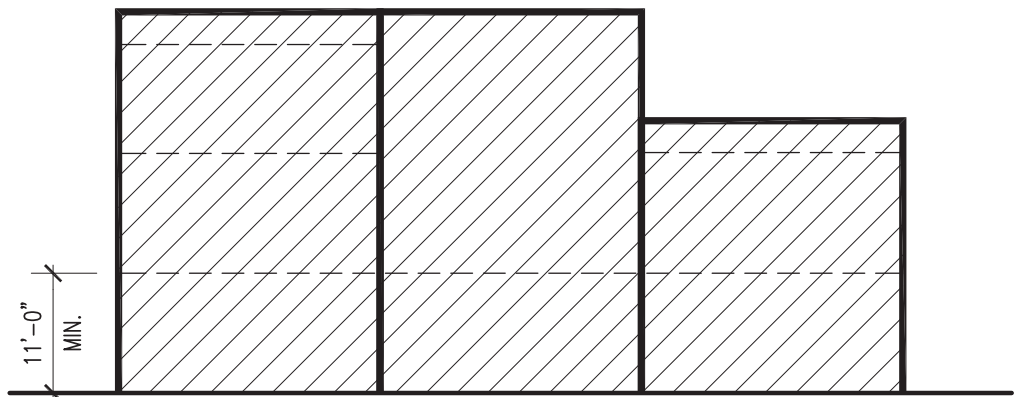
GROUND FLOOR HEIGHT REQUIREMENT.
